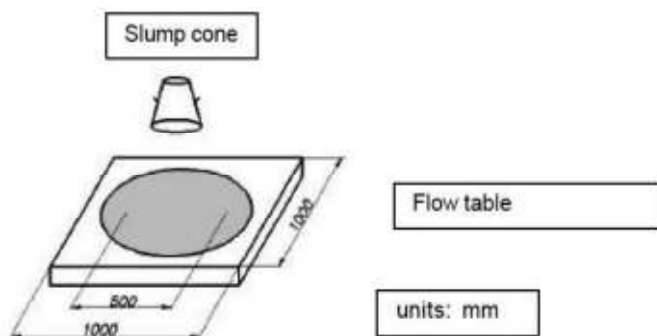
Slump Flow Test Equipment. (EFNARC, 2002).
